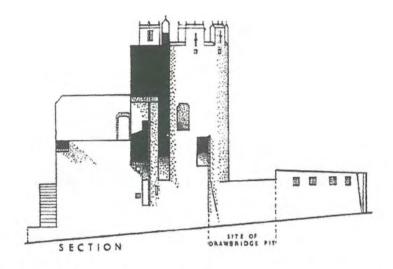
Porth Uchaf, Conwy, Cross Section showing possible extent of drawbridge pit (RCAHMW 1956)
